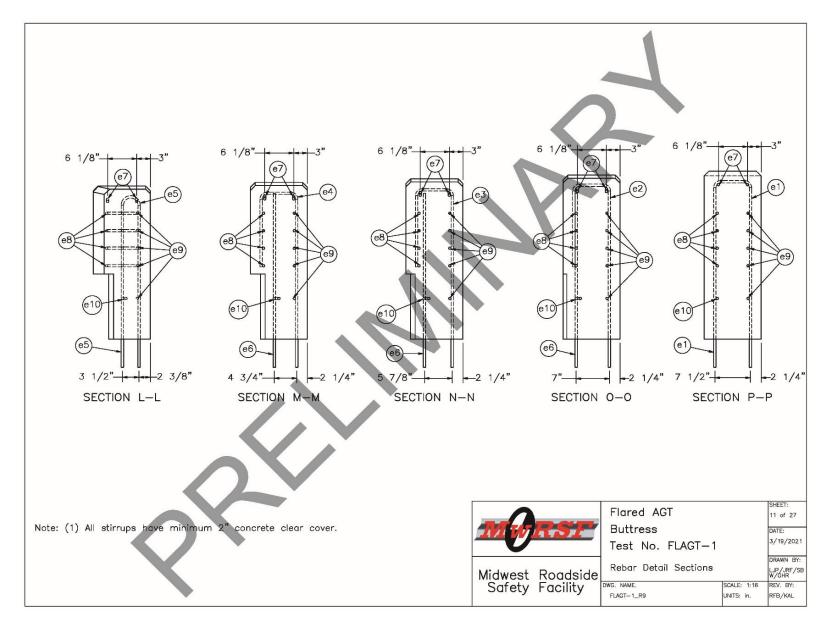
Rebar Detail Sections, Test No. FLAGT-1
